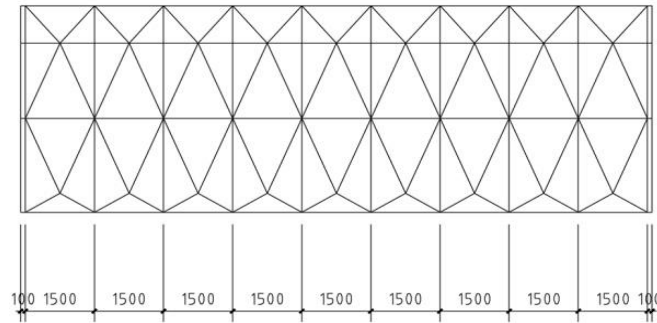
Diagram of dimension of side façade of the weaving-type truss structure
